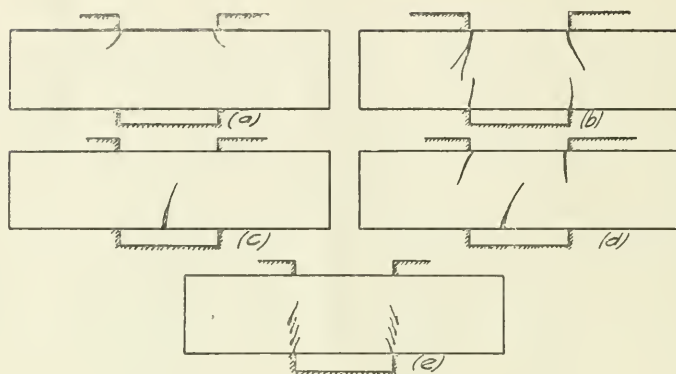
MANNER OF FAILURE IN RESTRAINED BEAM SHEAR TEST PIECE.
